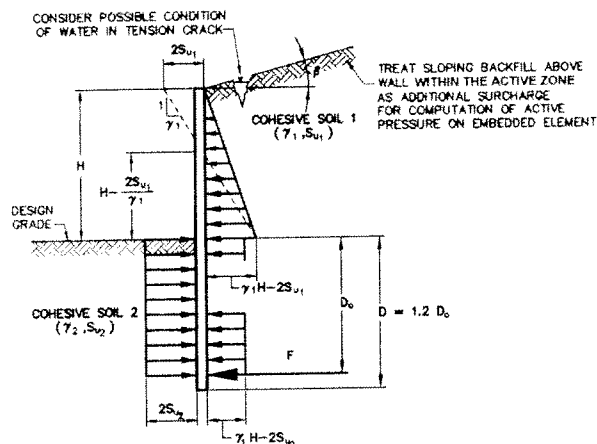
Unfactored Simplified Earth Pressure Distributions for Temporary Nongravity Cantilevered Walls with Continuous Vertical Wall Elements Embedded in Cohesive Soil and Retaining Cohesive Soil Modified After Teng (1962).
